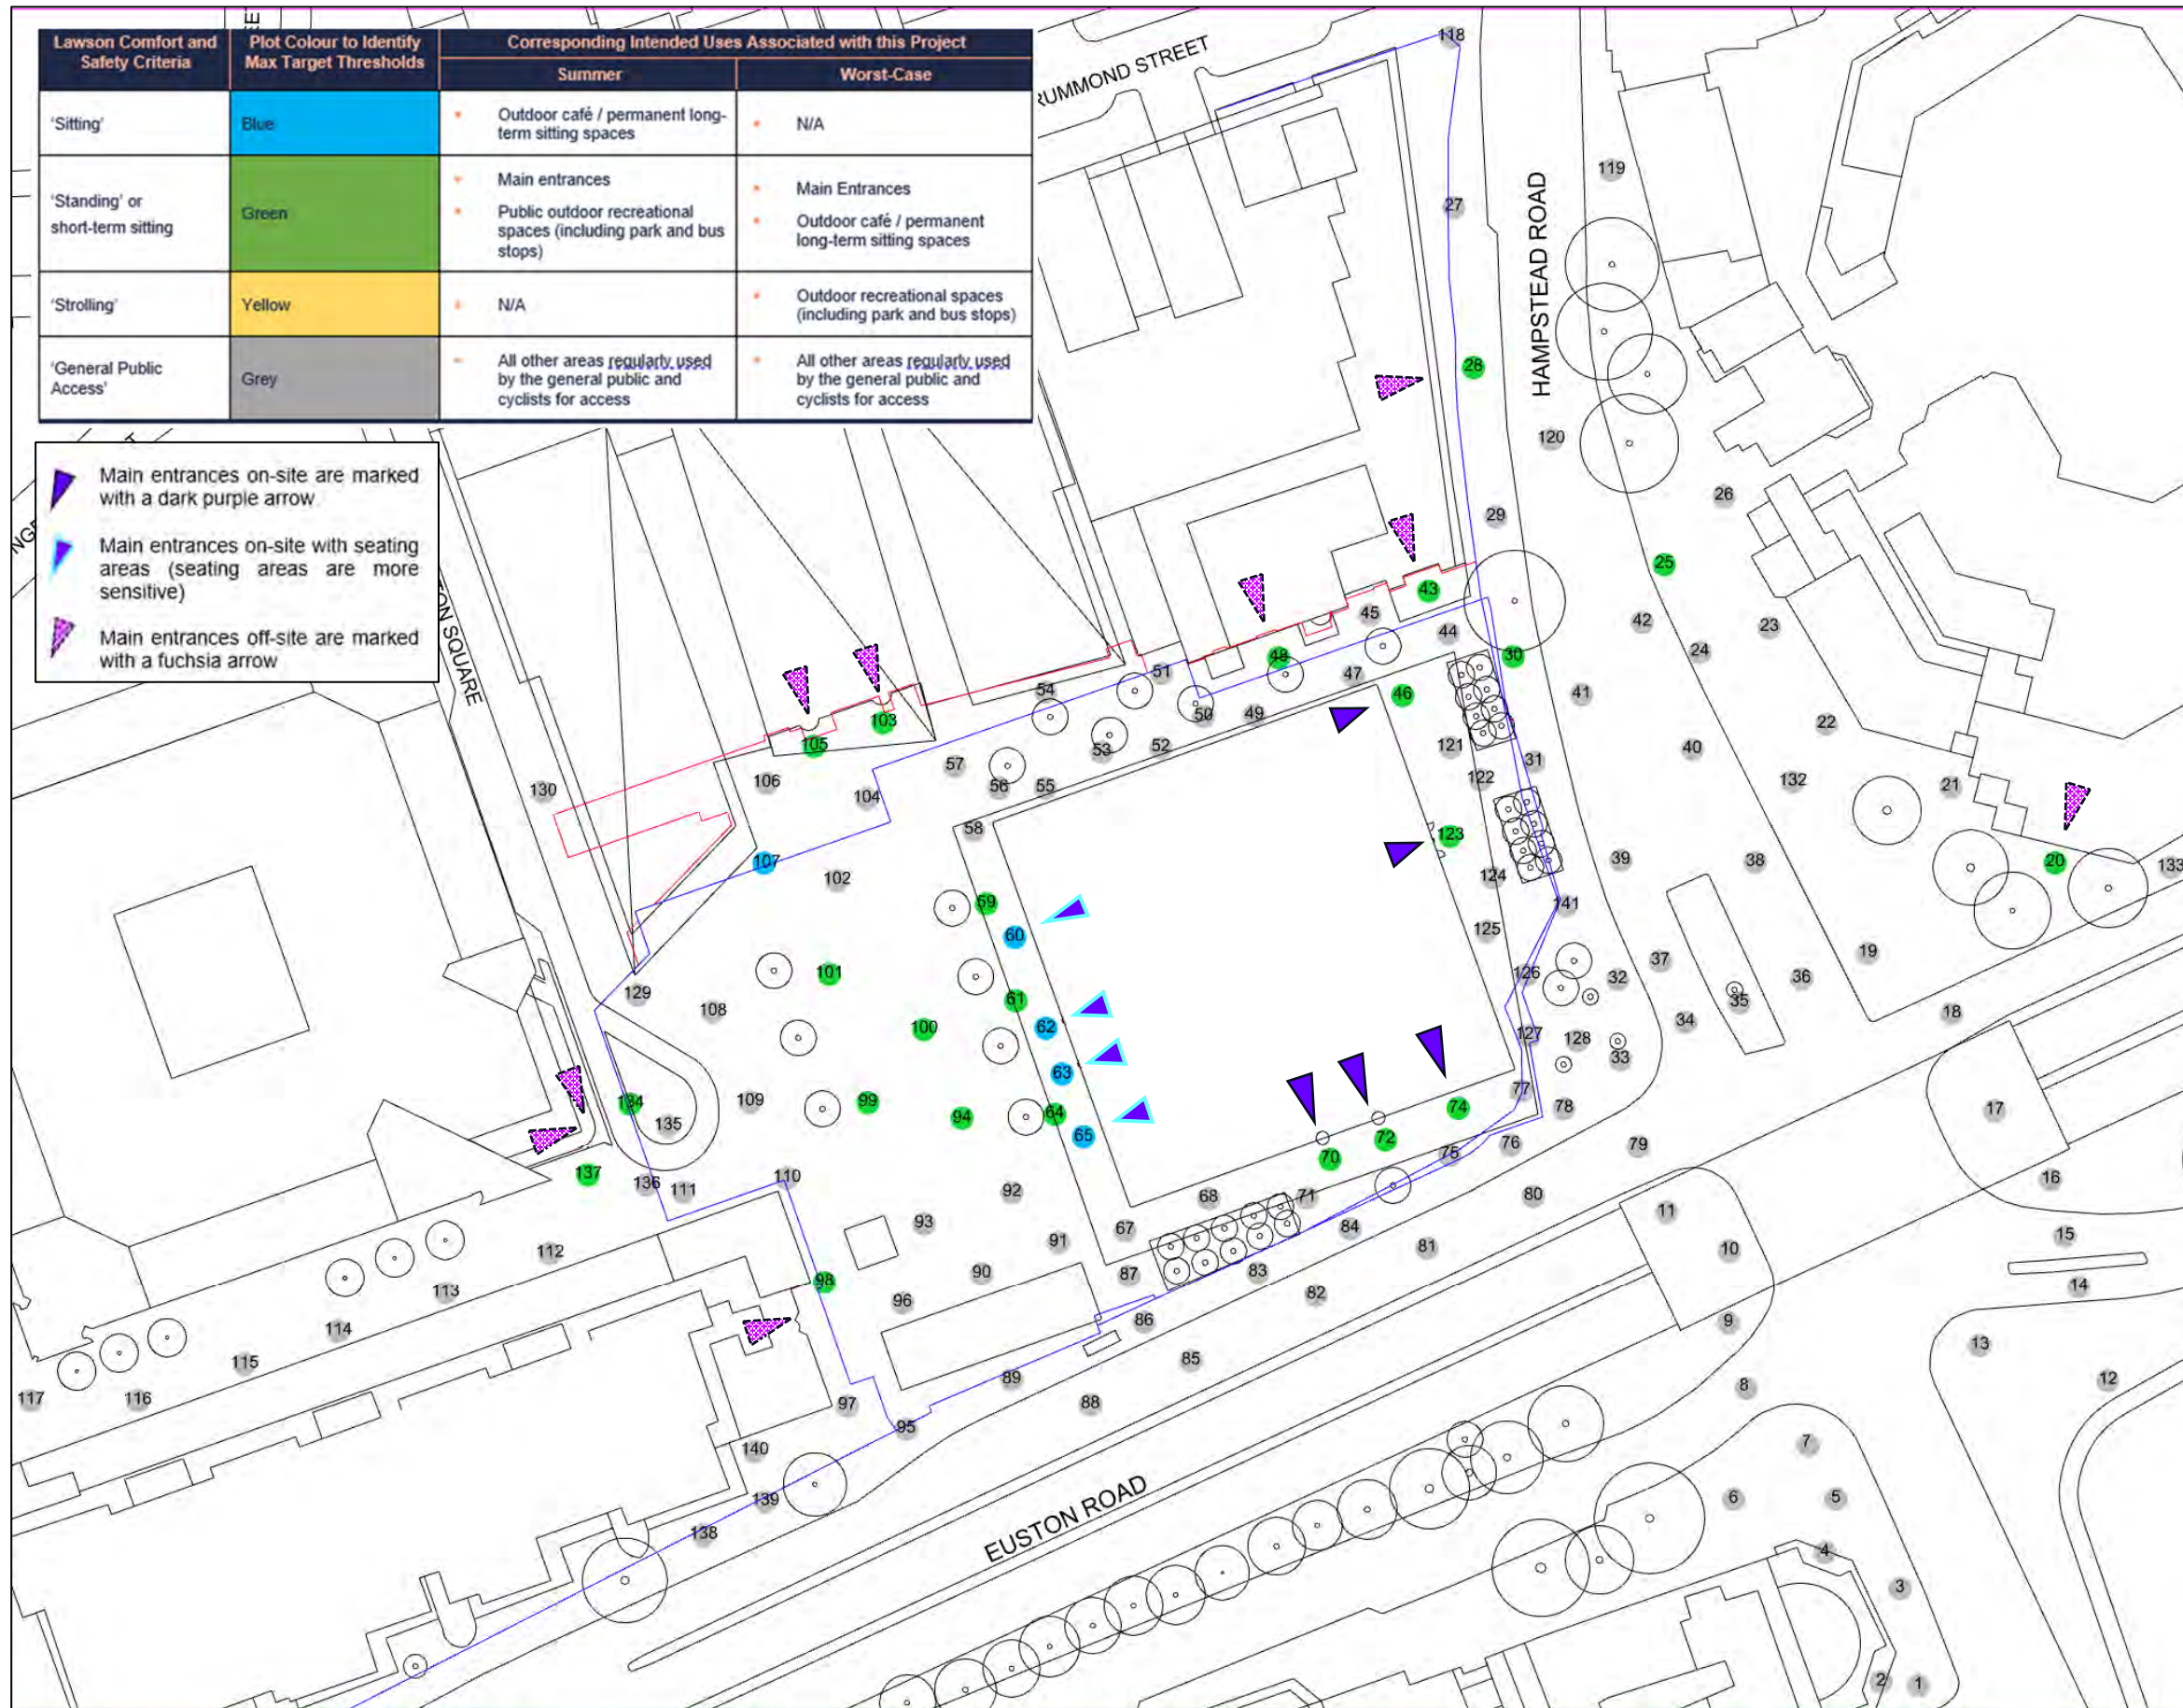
Ground floor plan of the proposed development showing the locations of entrances.
